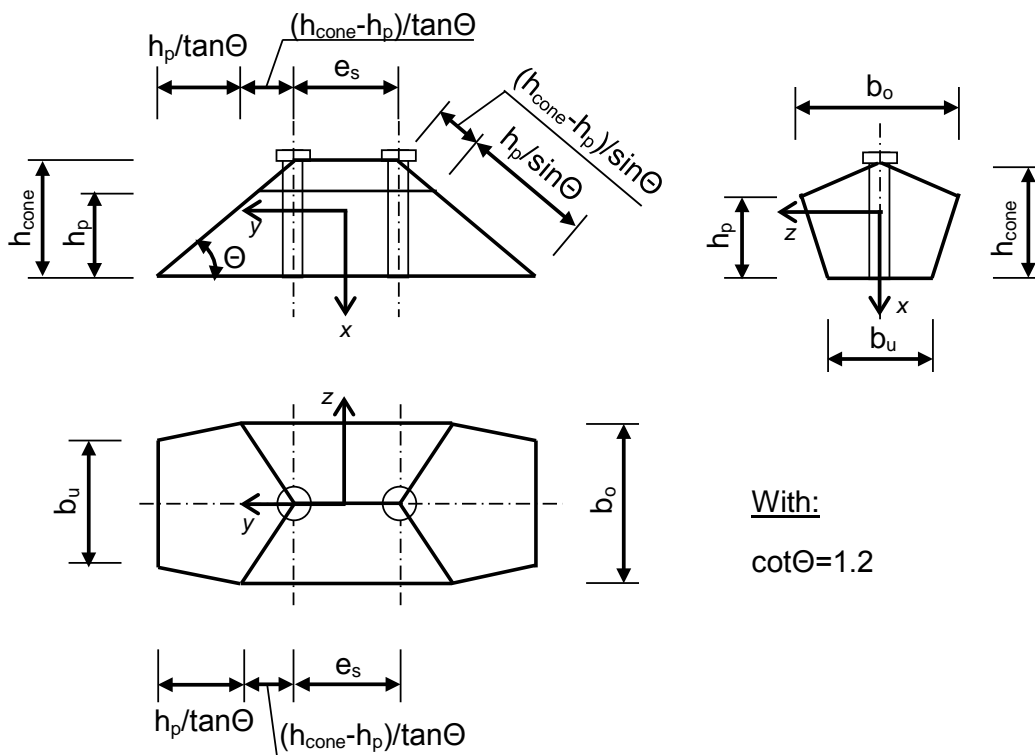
Shape and dimensions of the failure cone for studs welded in mid and staggered position in open deck shapes.
